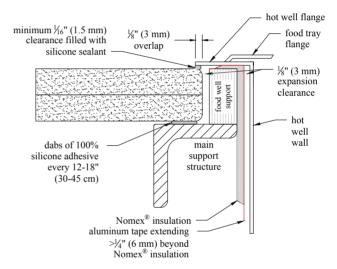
Cutout Cross Section View with Angle Iron Support – Underlayment
